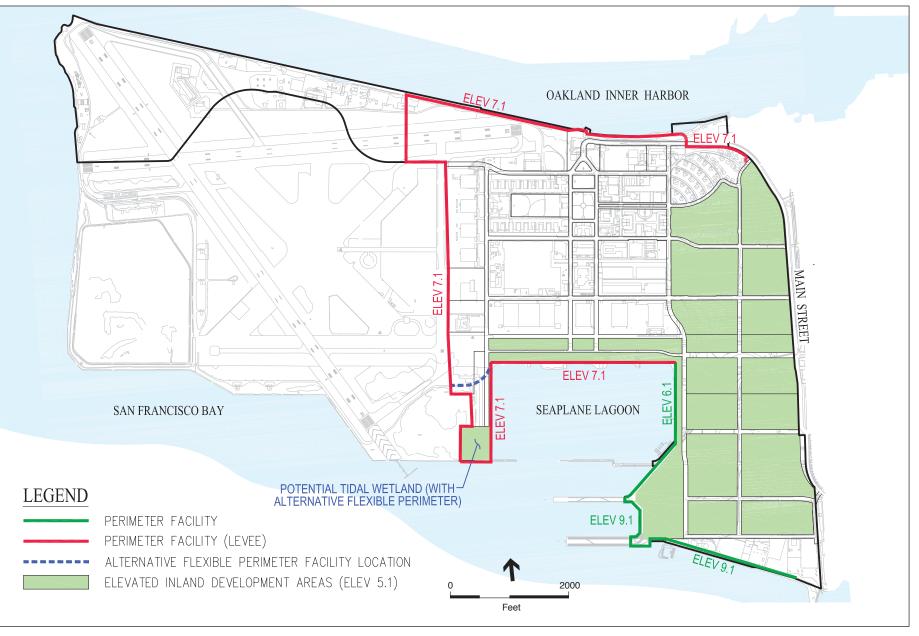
illustrates the initial flood protection system and minimum elevations throughout Alameda Point.
